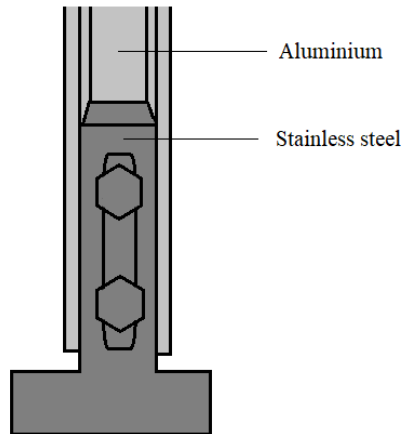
Schematic of connection between stainless steel and aluminium handrails support.
